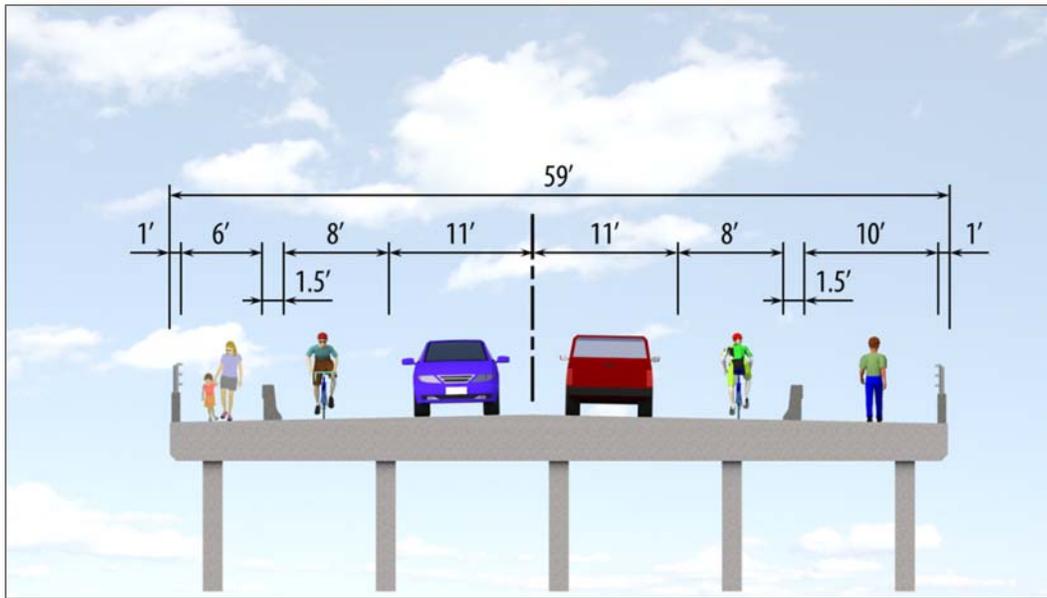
BUILD ALTERNATIVE 2 - BRIDGE TYPICAL SECTION
